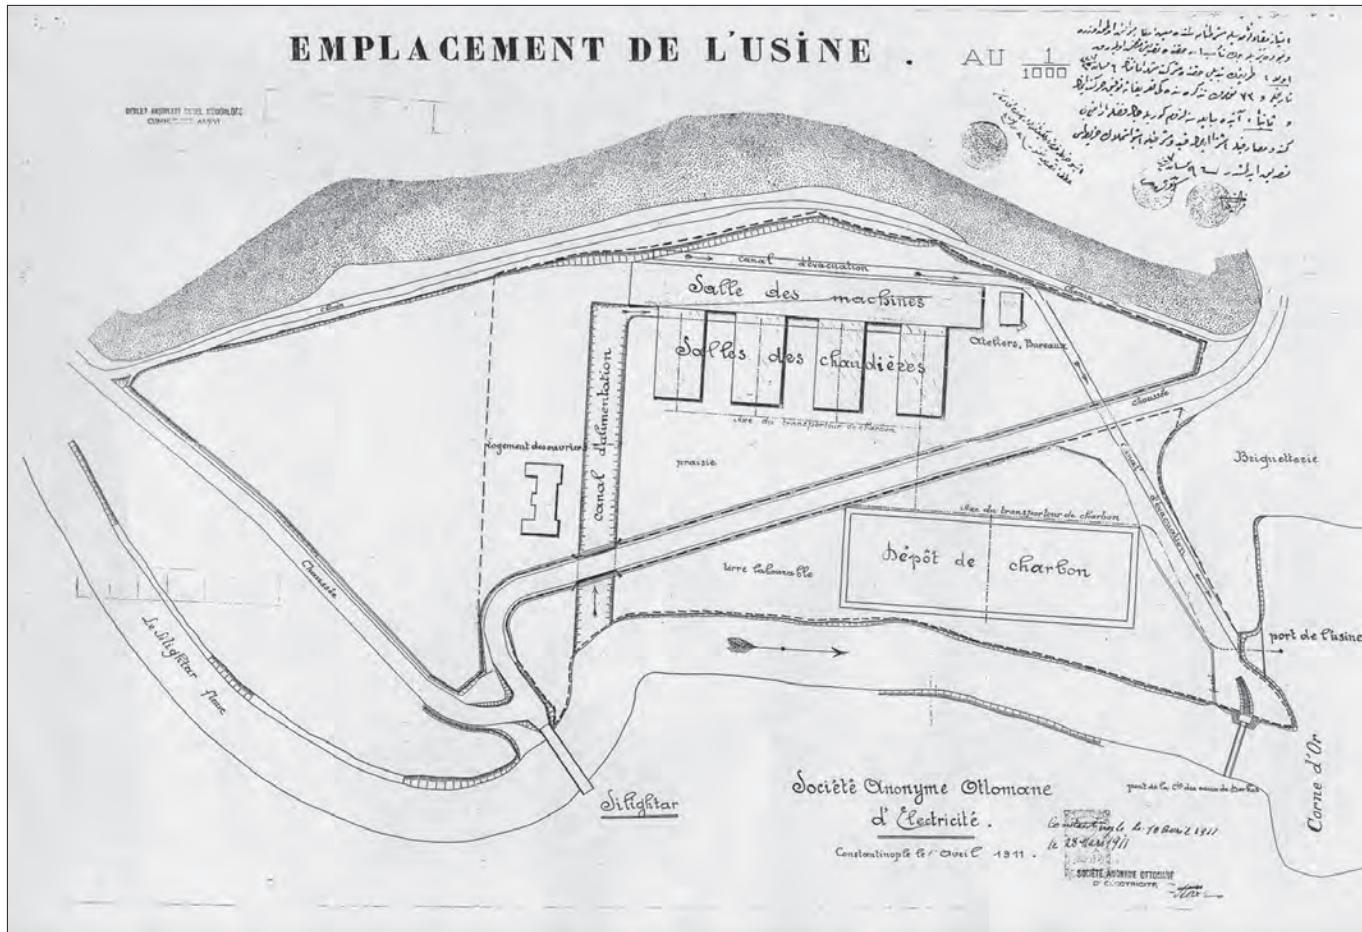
Silahtarağa Power Plant, site plan drawn in 1910.
